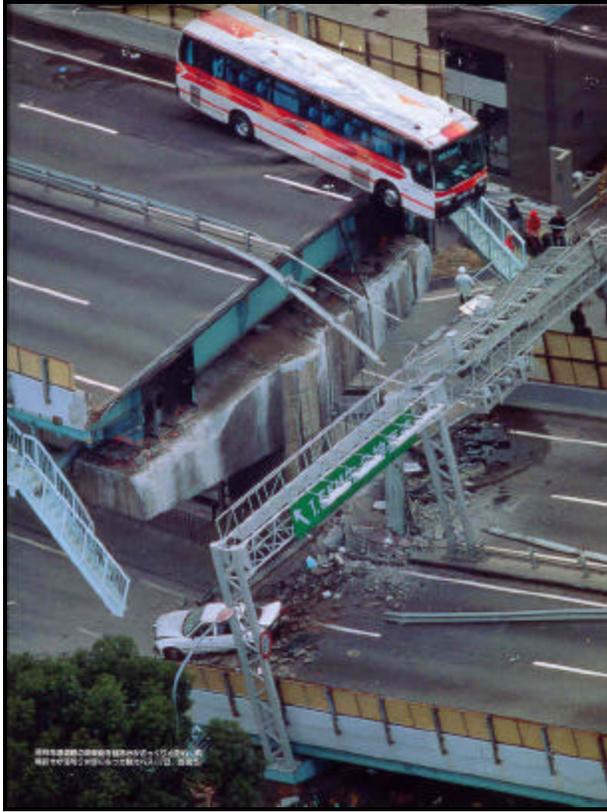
Collapse of steel deck bridge after Kobe 1995 Earthquake (12)
